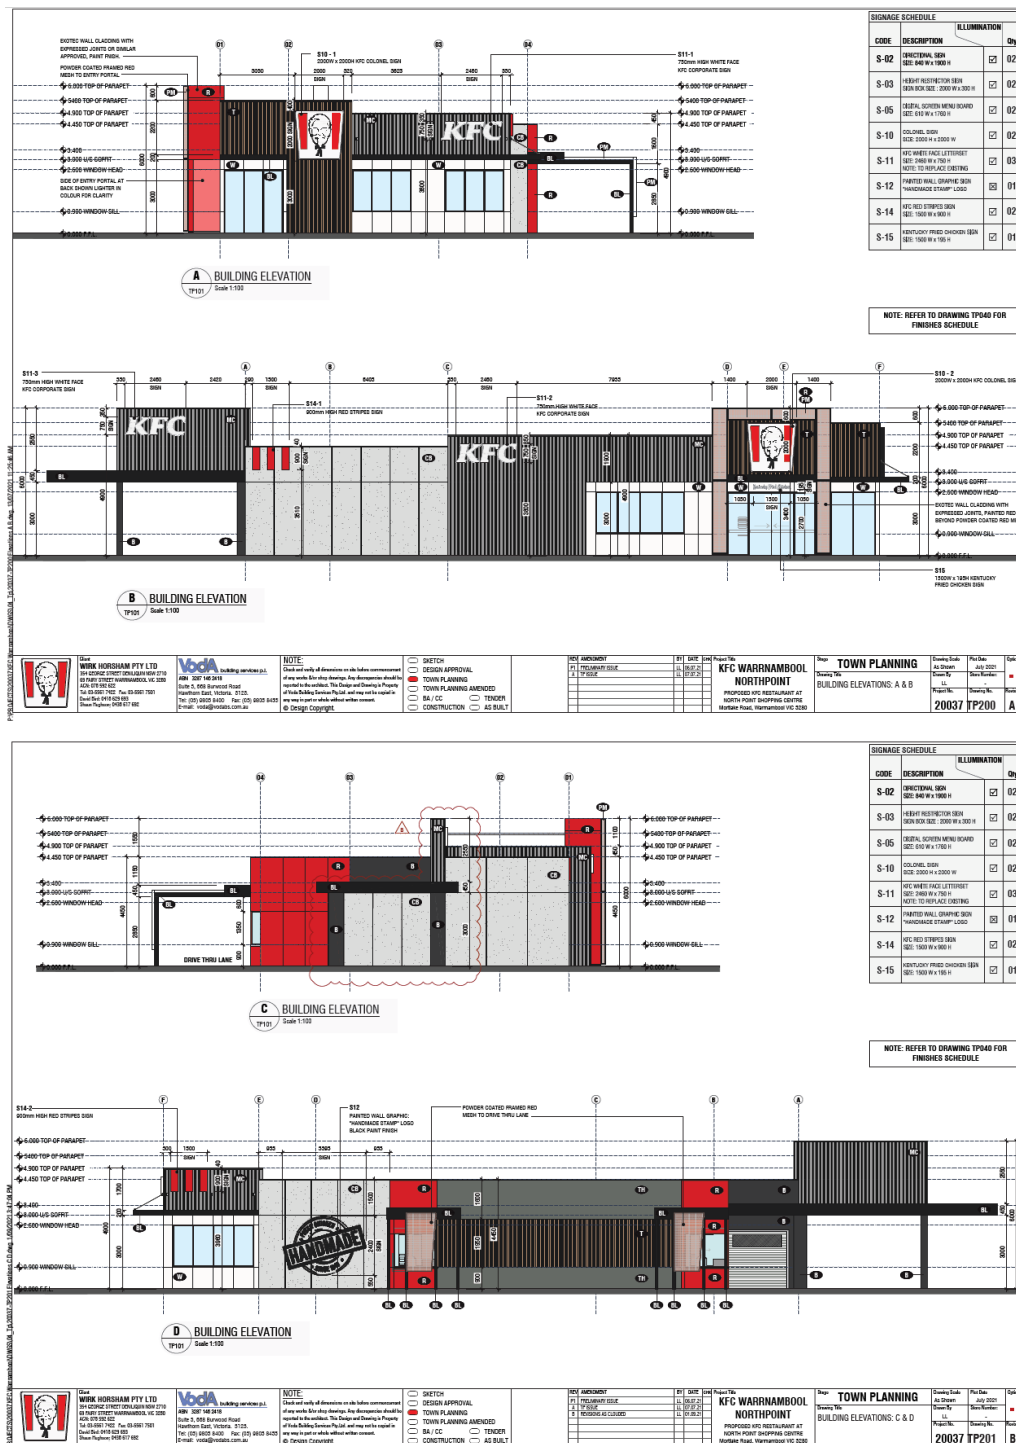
Proposed elevations (Source: Plans submitted by the applicant)
